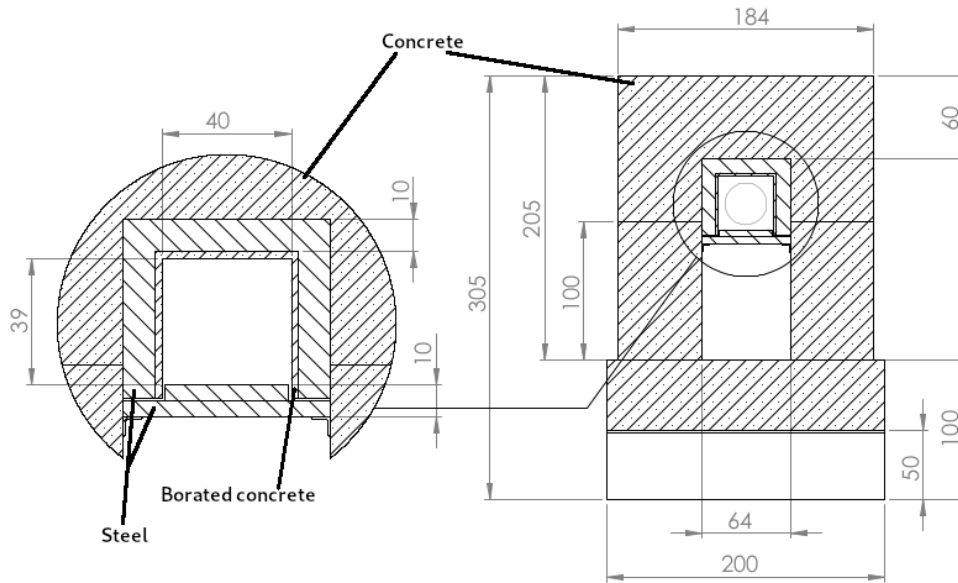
Engineering drawing of the guide shielding [62] showing the relevant geometrical parameters, with a detailed view of the region around the guide on the left. This picture is a vertical section of what is shown in figure 5.1(a).
